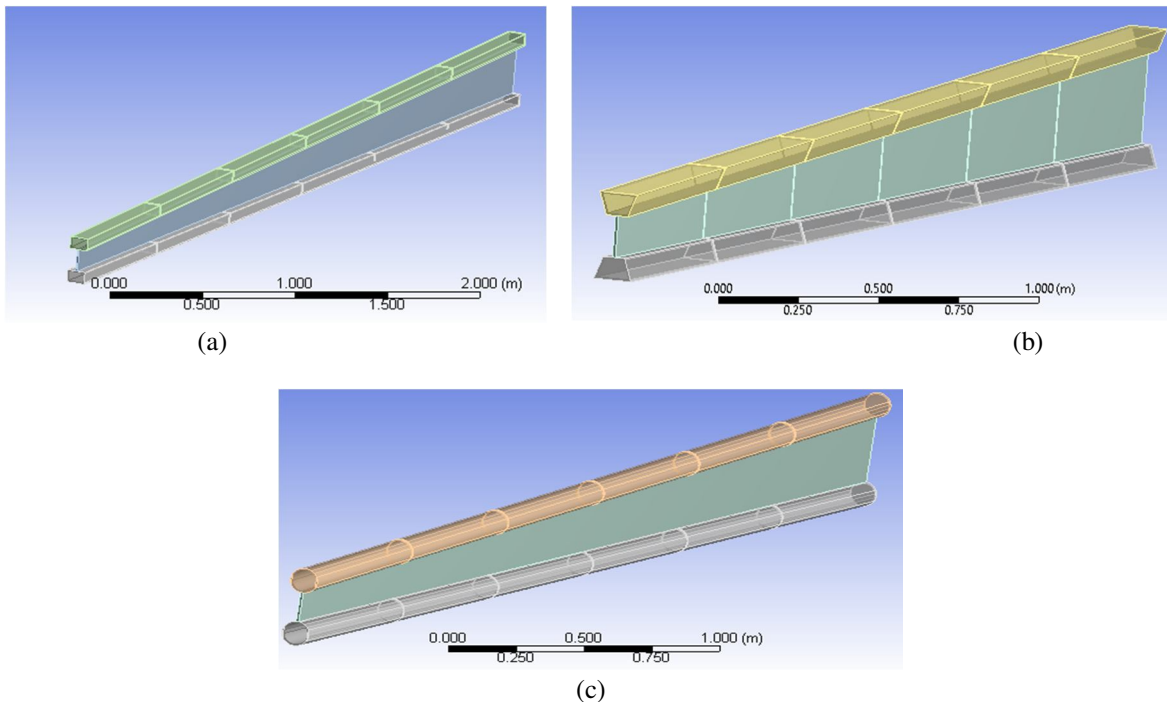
Tapered steel column with (a) Rectangular hollow flange (b) Trapezoidal hollow flange (c) Tubular hollow flange
